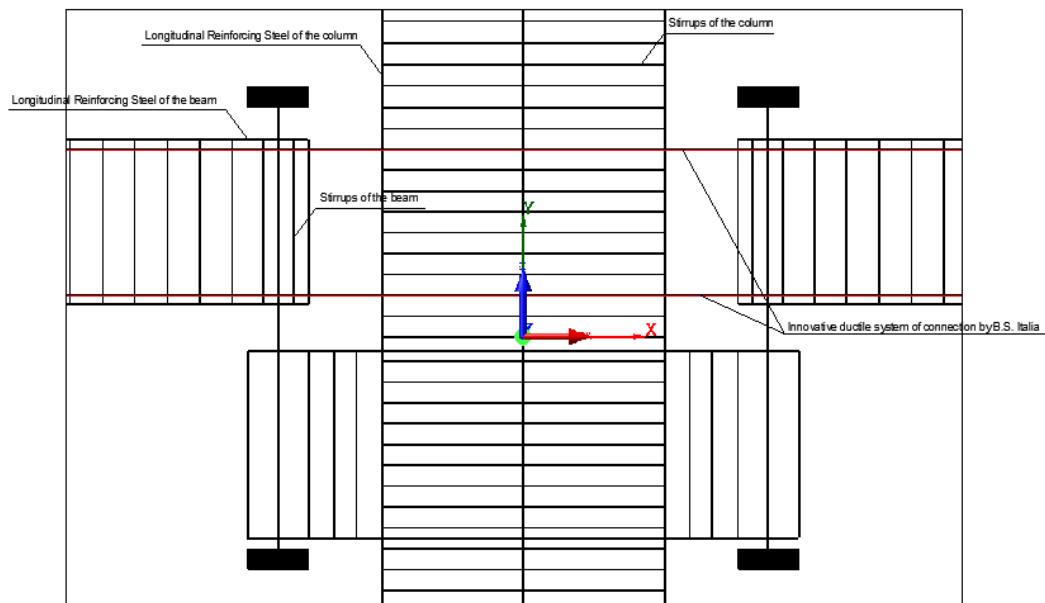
f) – Reinforcing steel layout: zoom of beam-column joint region.
